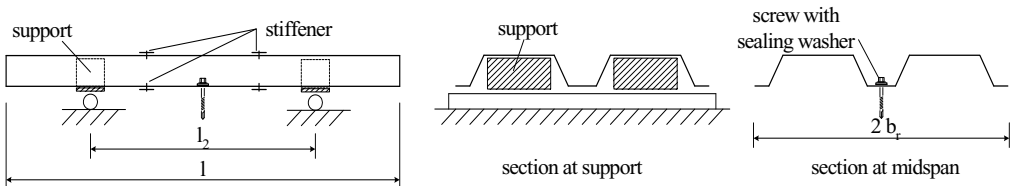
Test set-up for fixings of steel and aluminium sheeting.
